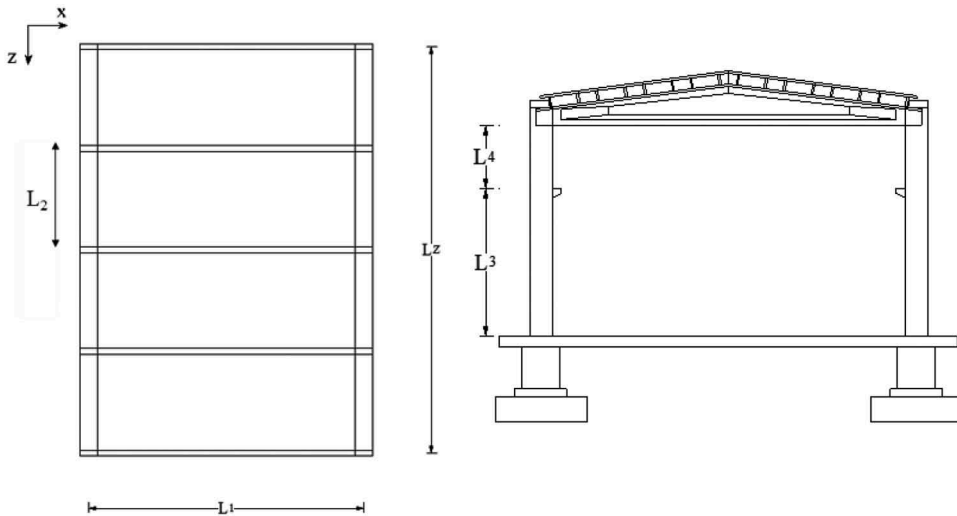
Example of precast industrial building. Left: plan view of structural elements; right: front view, including foundations.
